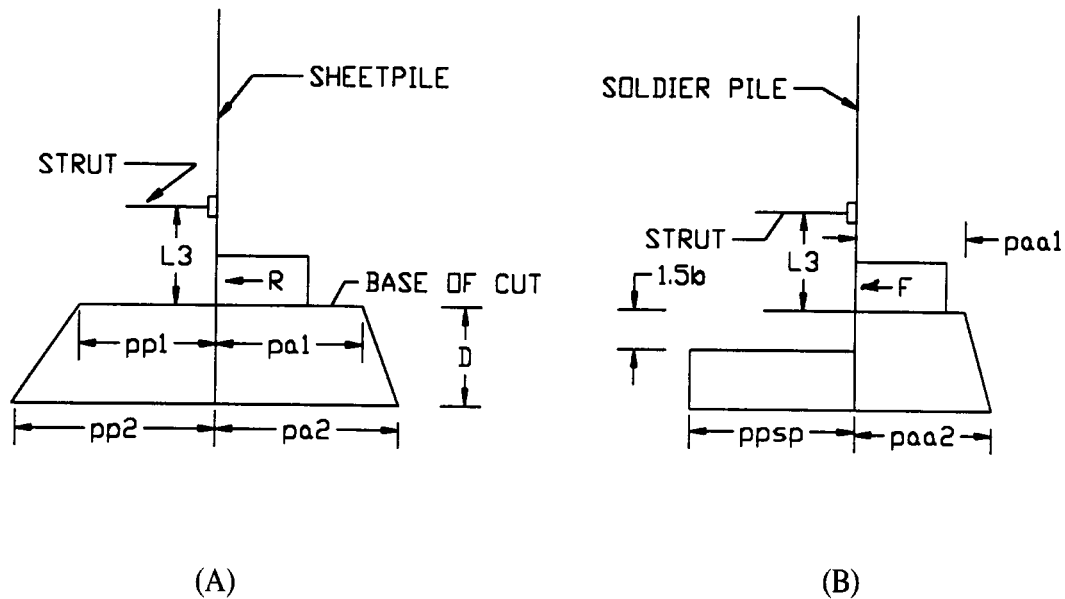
Depth of Penetration; A) Sheetpile Wall; B) Soldier Pile Wall
